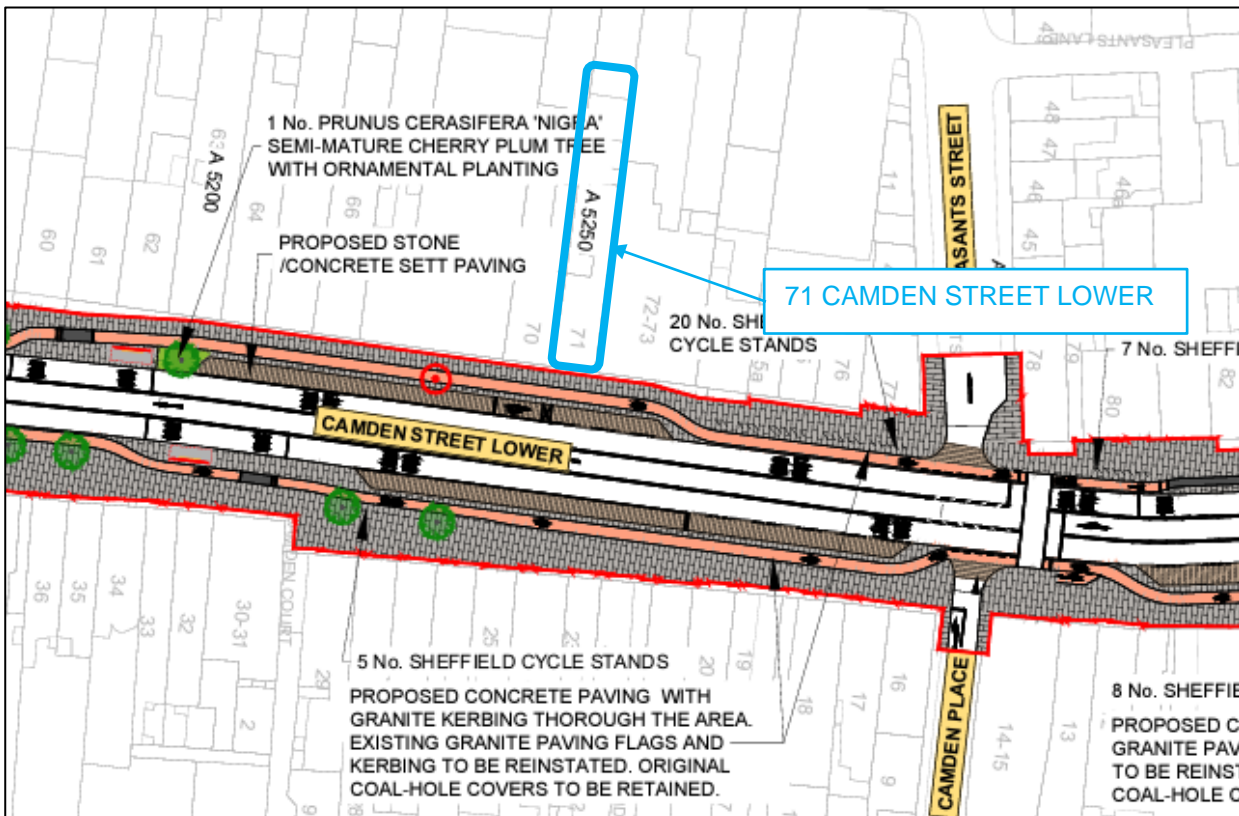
Landscaping General Arrangement of Proposed Scheme adjacent to 71 Camden Street Lower (Sheet 16)
